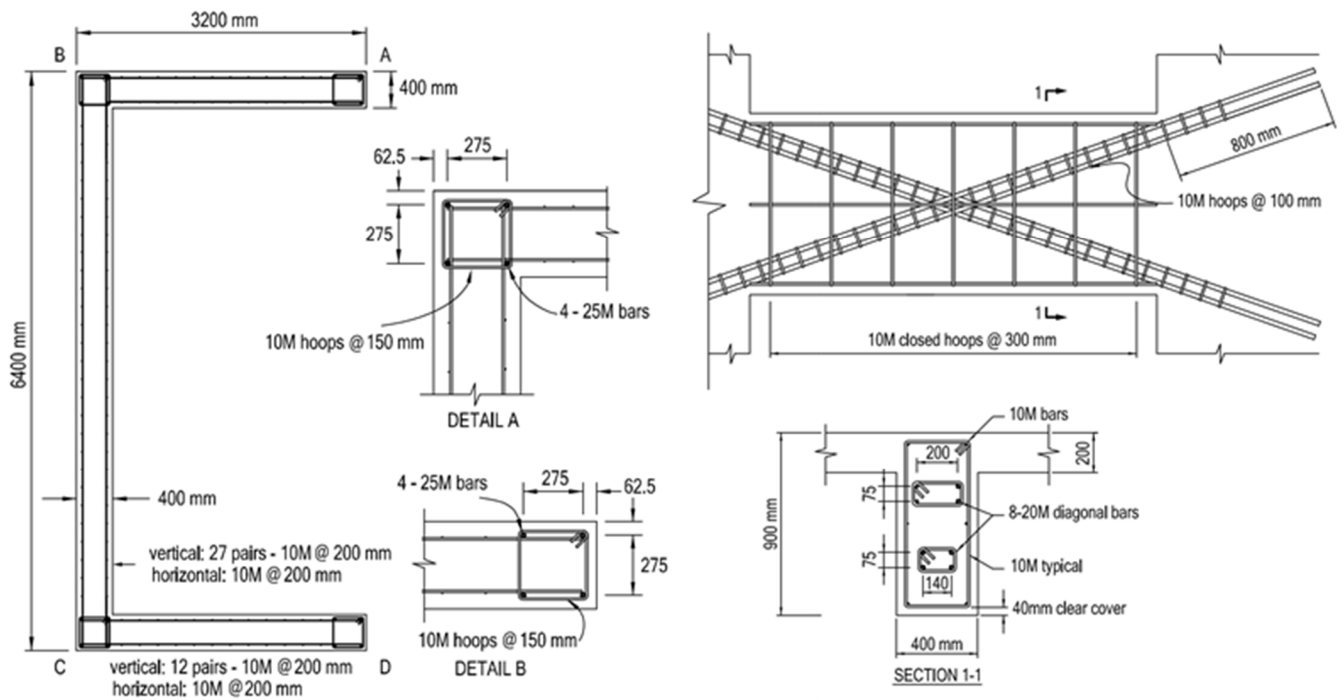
Geometrical and reinforcement configuration of the coupled RC core wall: a) C-shaped walls, b) Coupling beams (CSA A23.3-04, 2004)
